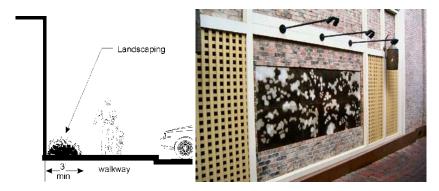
(C)(3)(b). Walkways should be separated from buildings by landscaping, except when adjacent to a storefront or when wall treatments are included that add visual interest to the pedestrians (right image).
